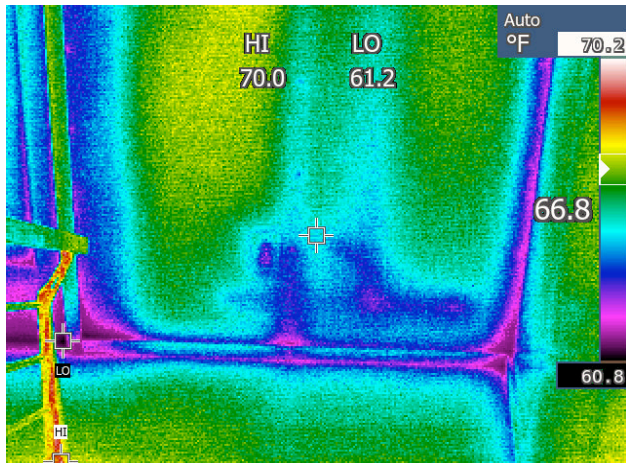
P1 thermal bridge at “strong wall” downstairs
